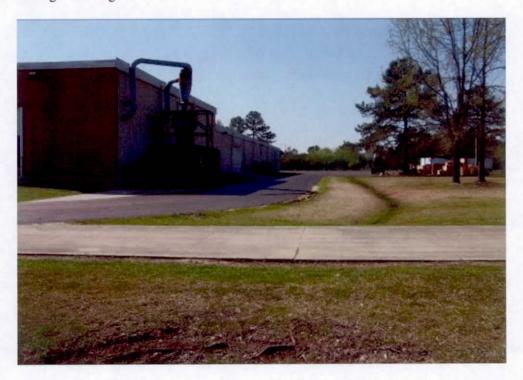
Facing south of the drainage ditch along Preston Street. The ditch receives drainage from the south side of the site. The ditch drains toward the viewer.
